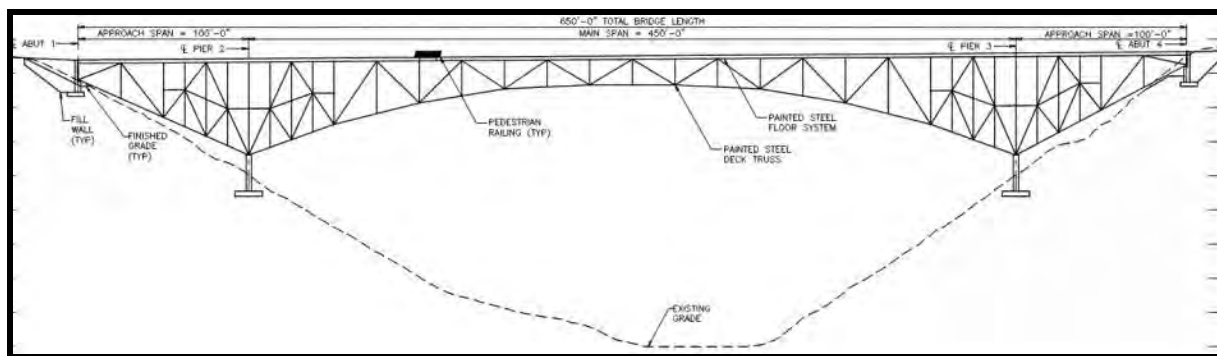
Proposed Elevation of AABC Bridge (Steel Deck Truss)
